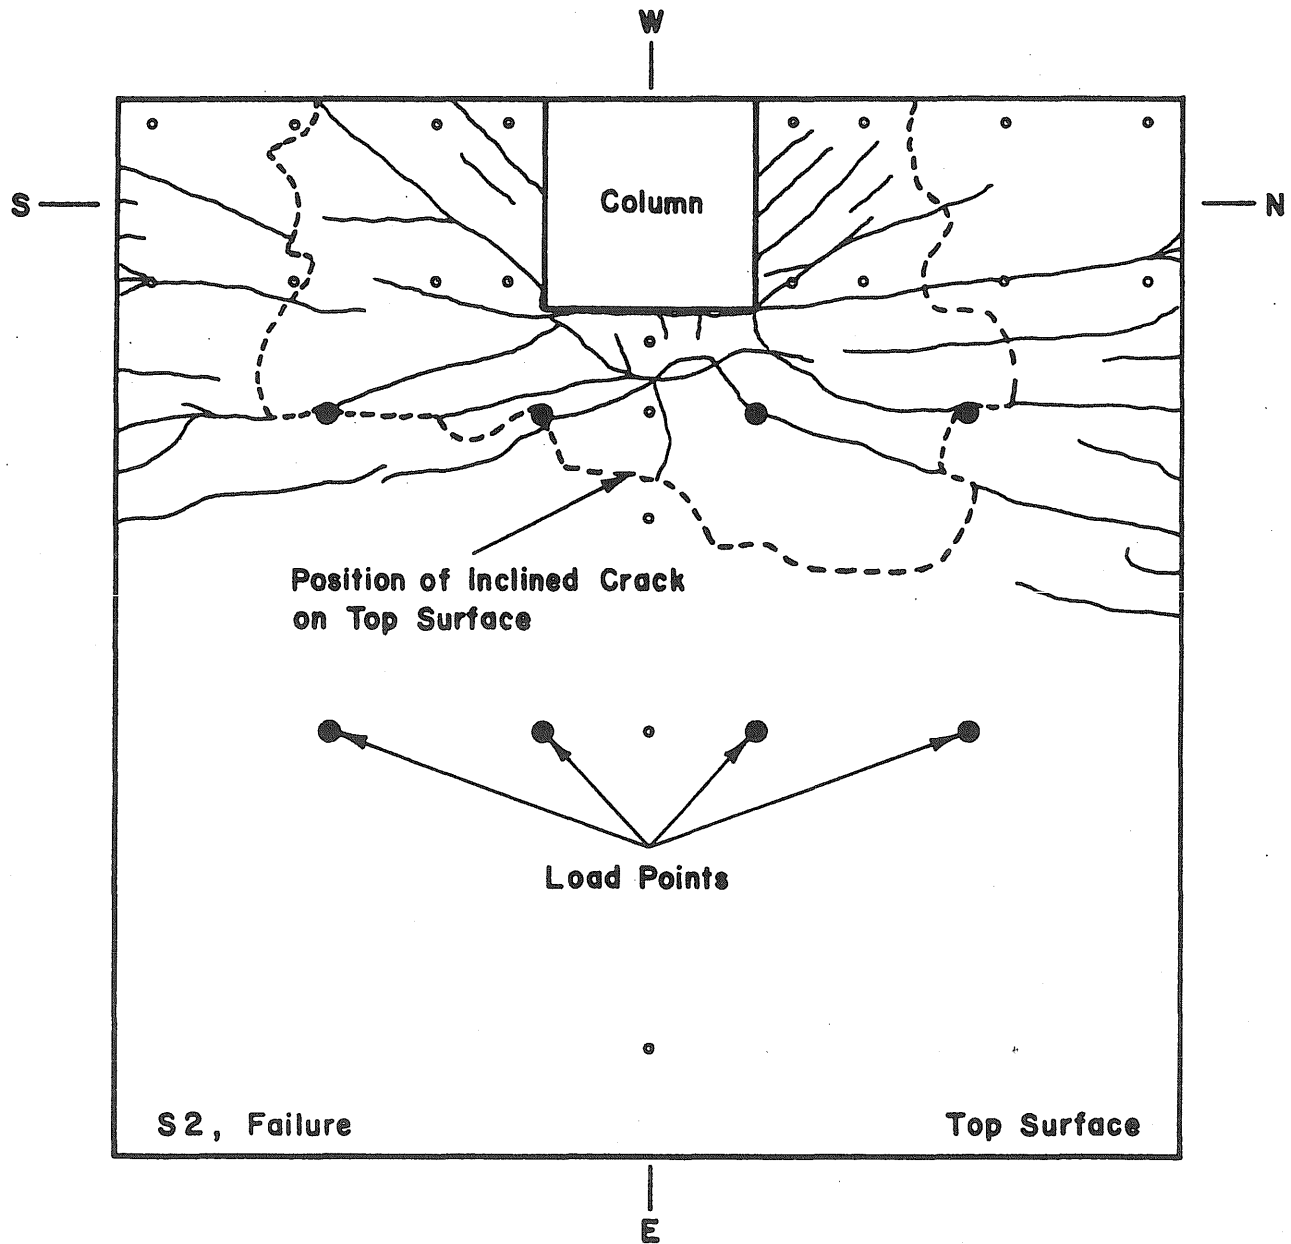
Crack Pattern at Failure on the Top Surface of Specimen S2
